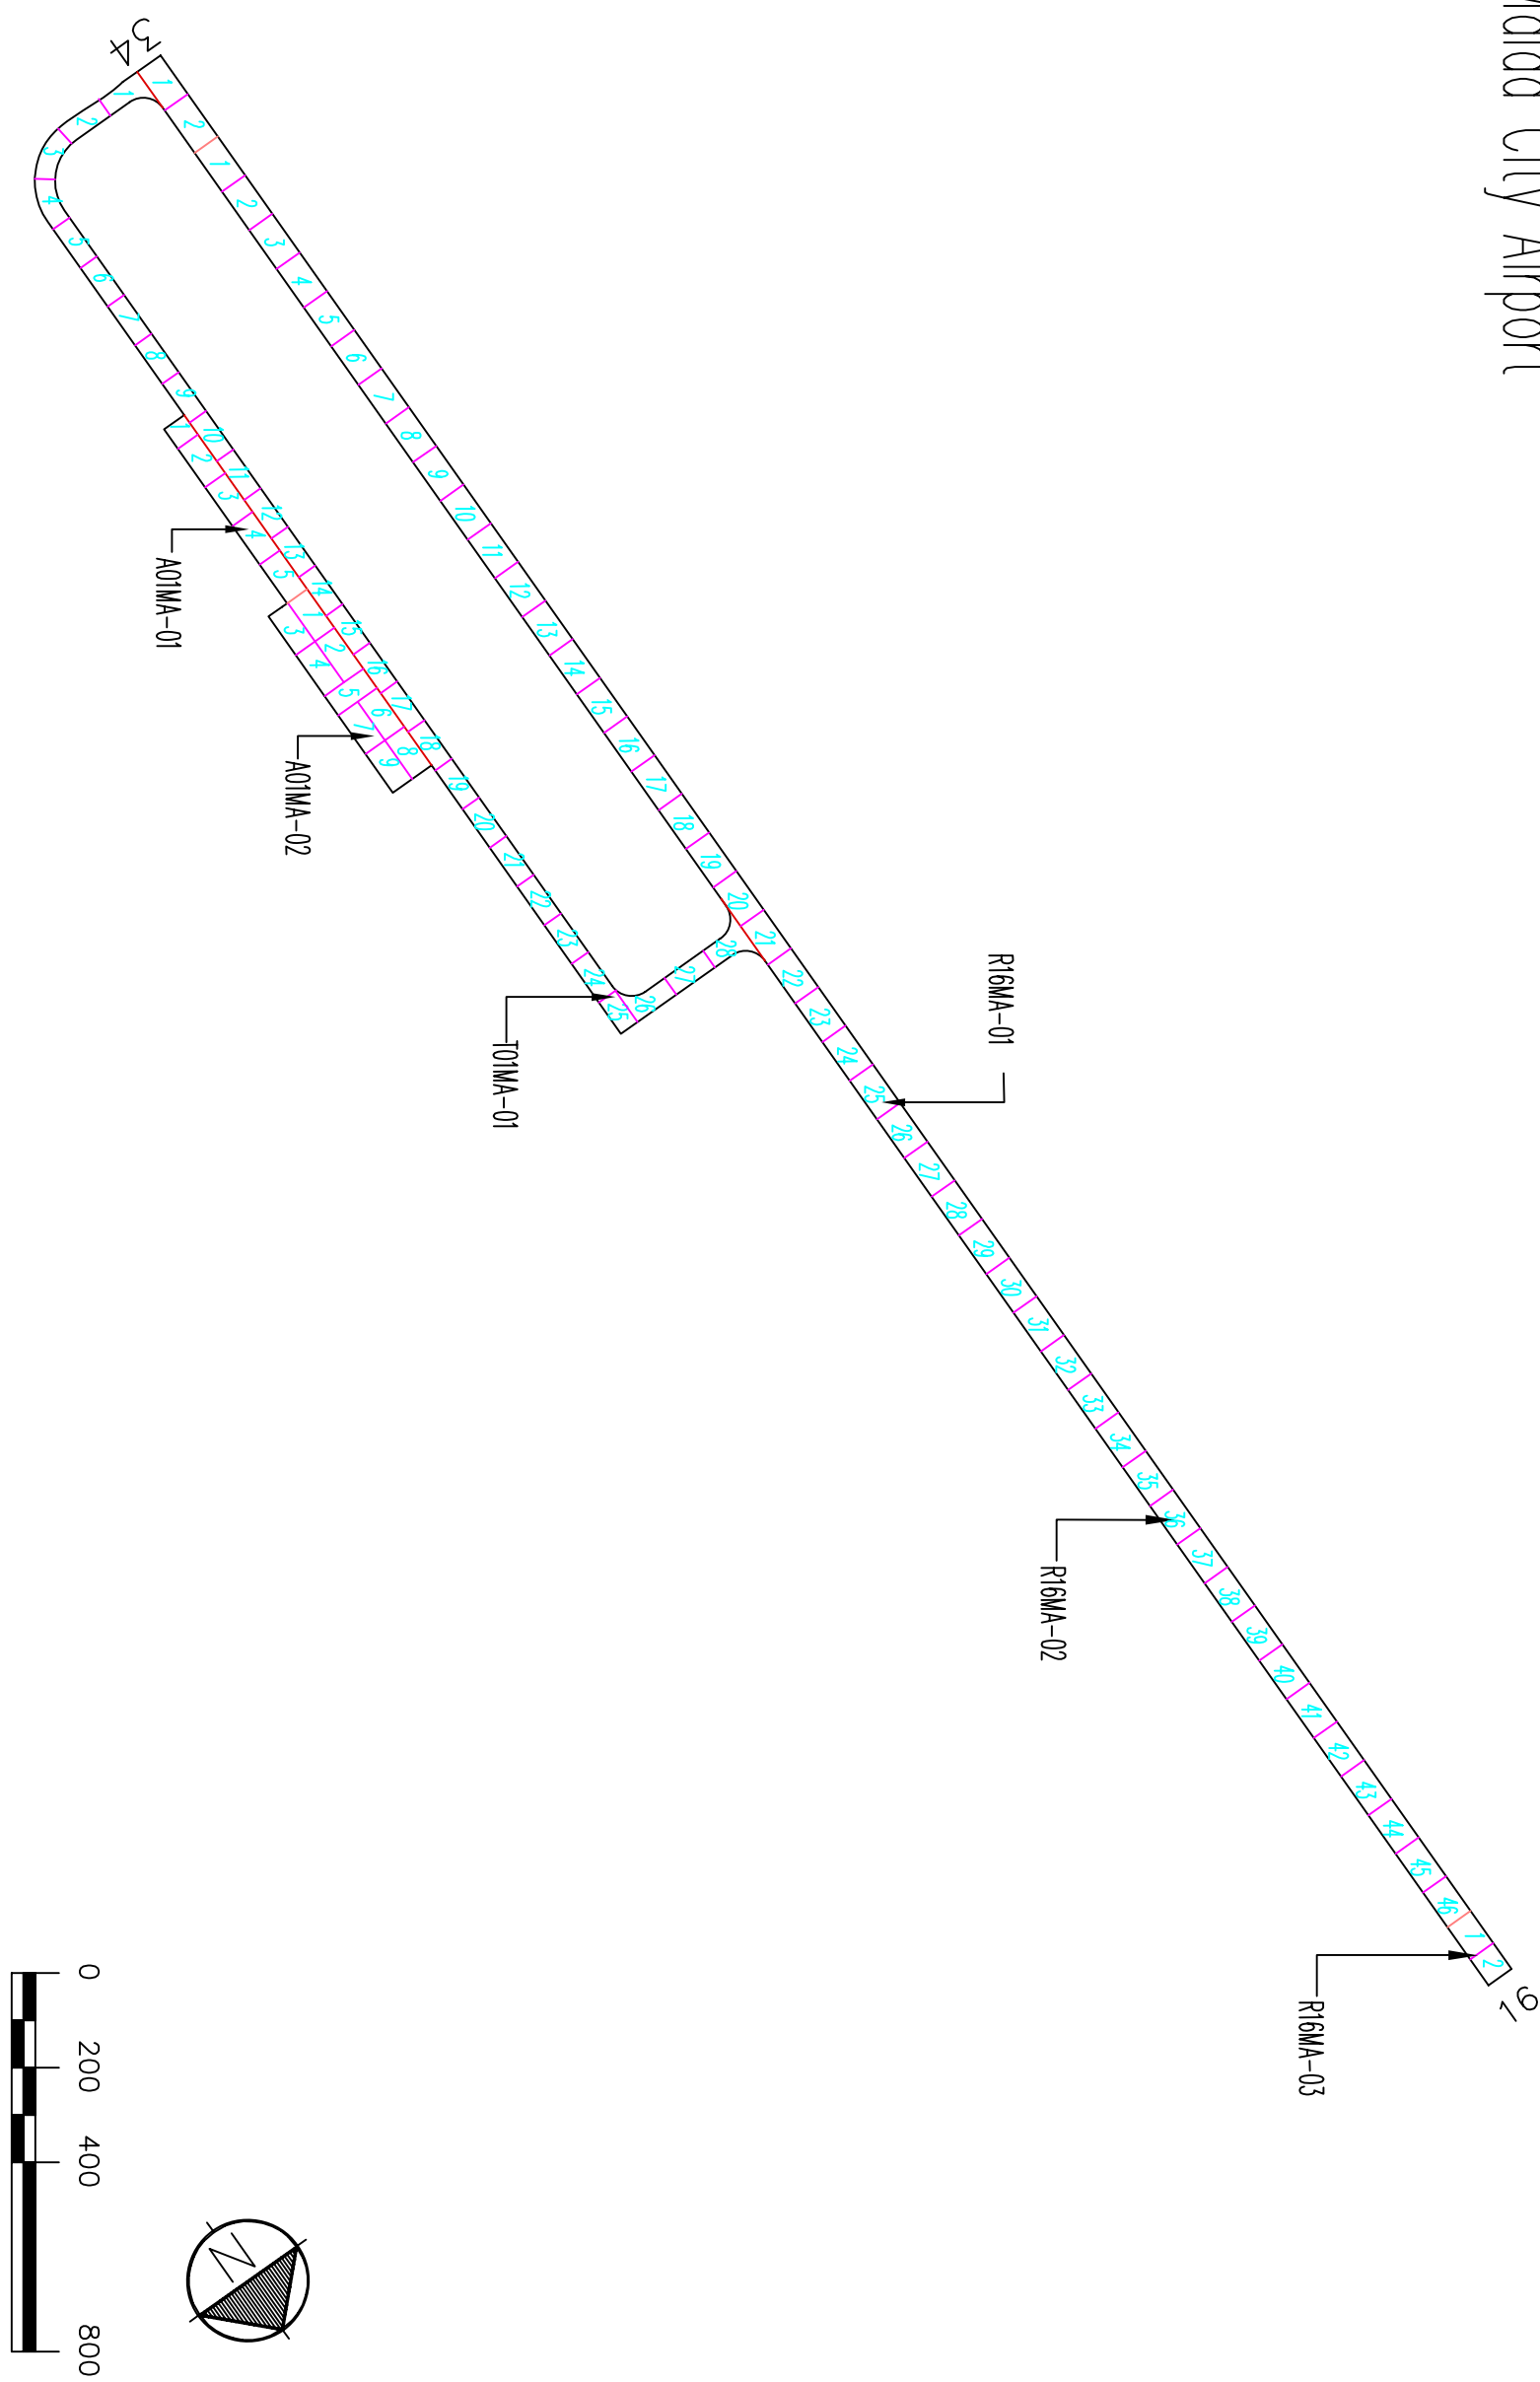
Pavement Branch, Section and Sample Unit Layout.
